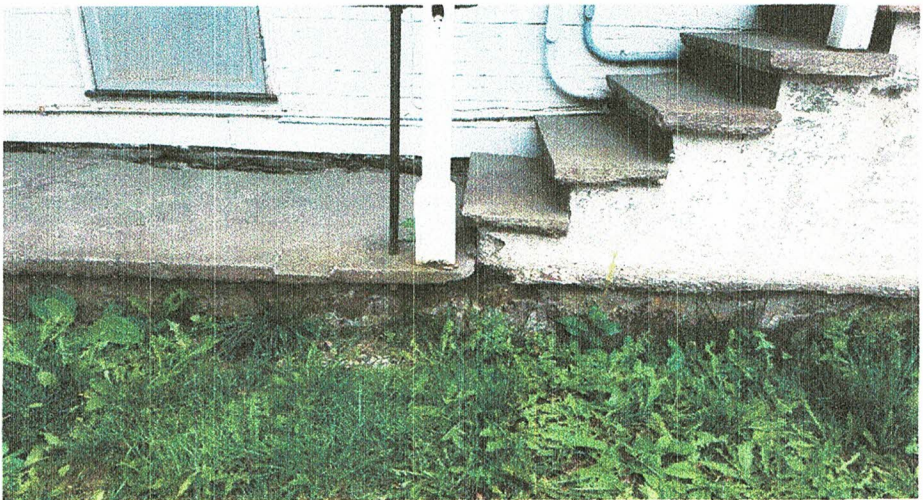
Eastern porch movement, eastern sill below grade, drainage towards building/crawlspace.
